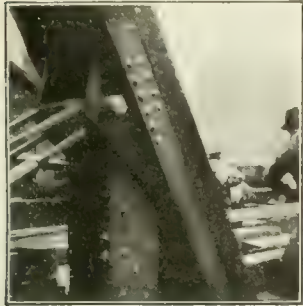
JACKING POST CONNECTION TO END POST OF TRUSS
